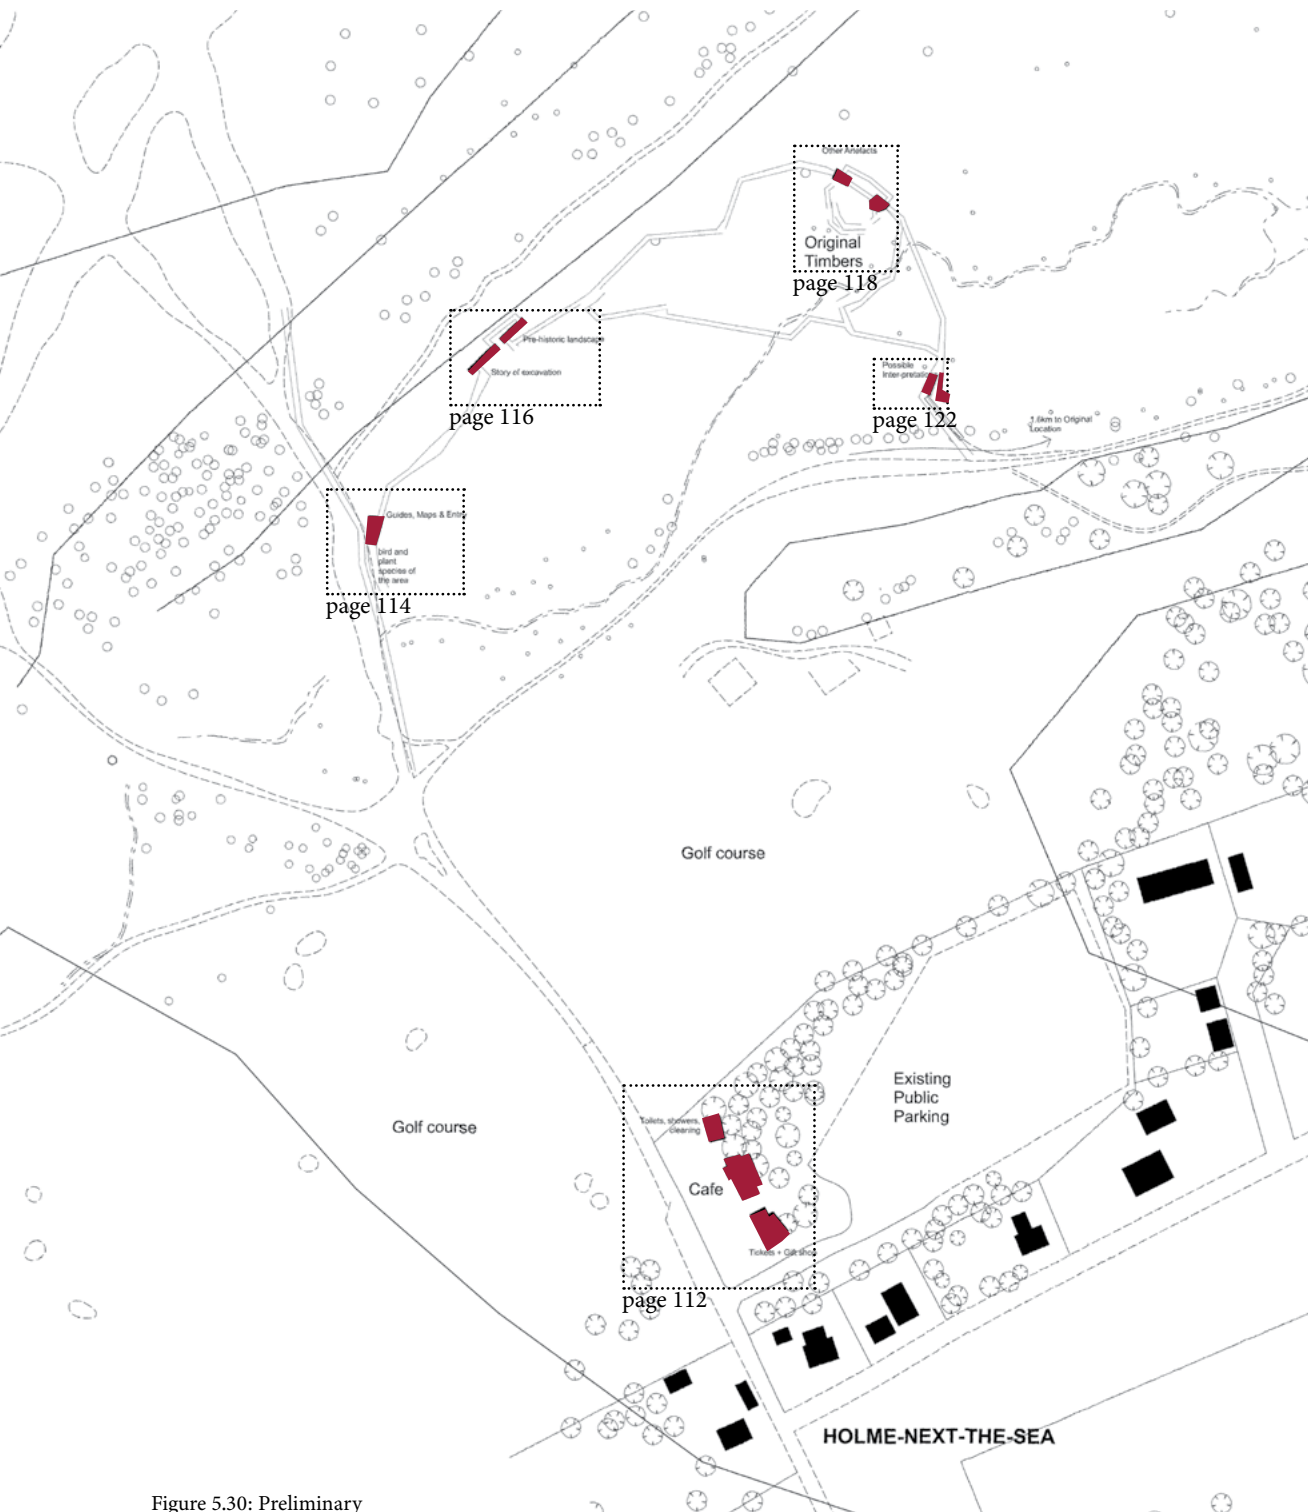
Preliminary layout of visitor centre and pavilions (Author, 2023).
